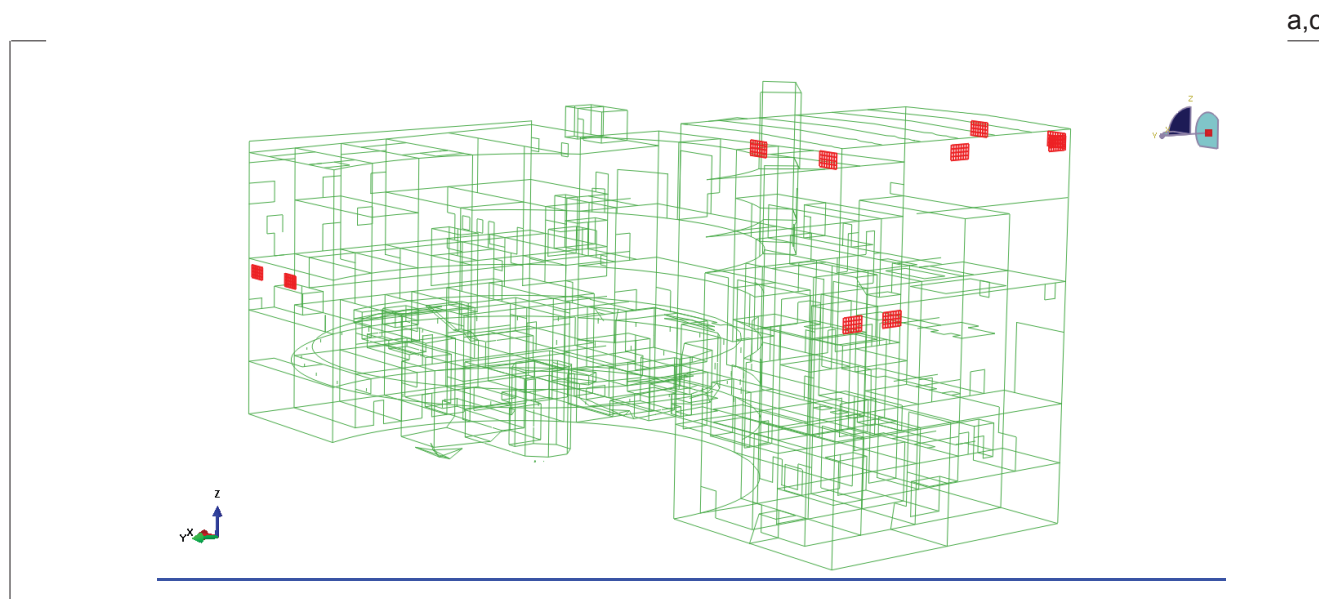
Schematic of Impact Locations on Auxiliary Building Exterior Walls
